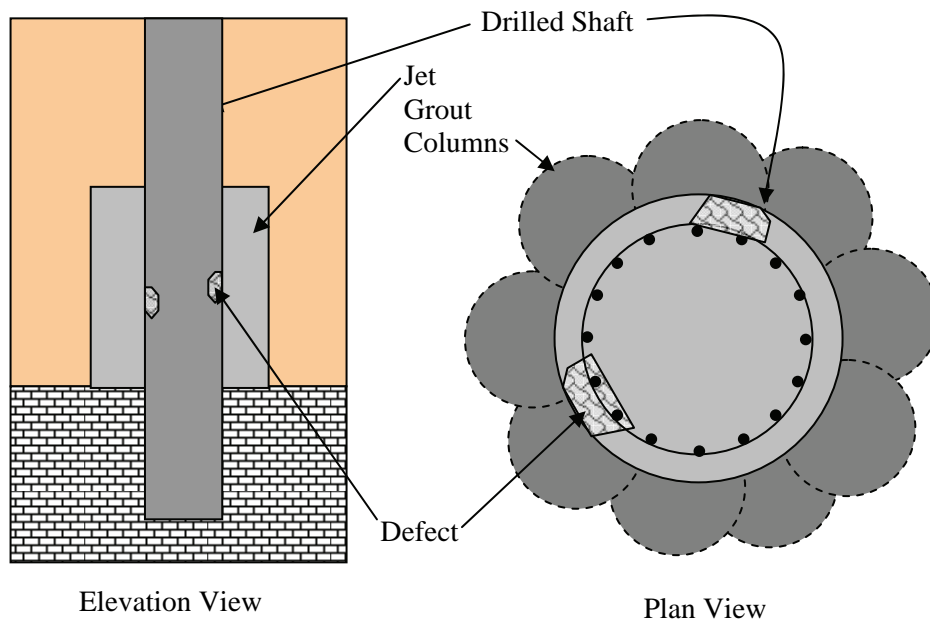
Jet Grouting Application for Drilled Shaft Repair
